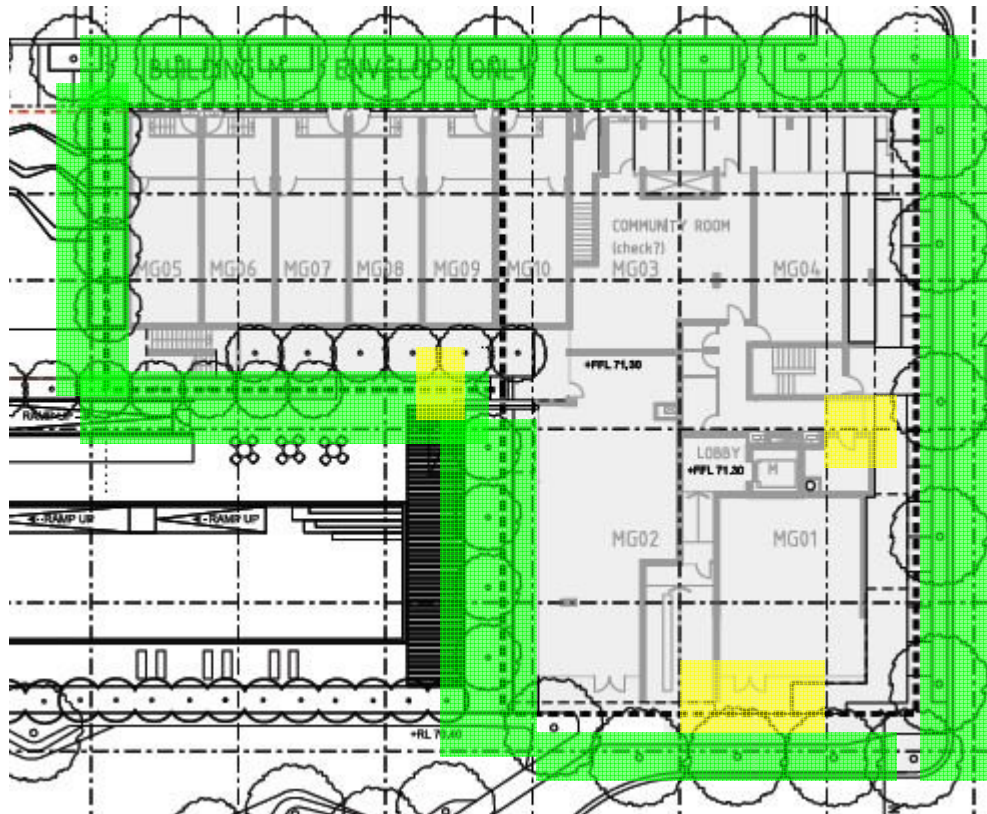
Schematic plan view of the proposed Building M with the recommended wind criteria overlaid on adjacent ground level areas.
